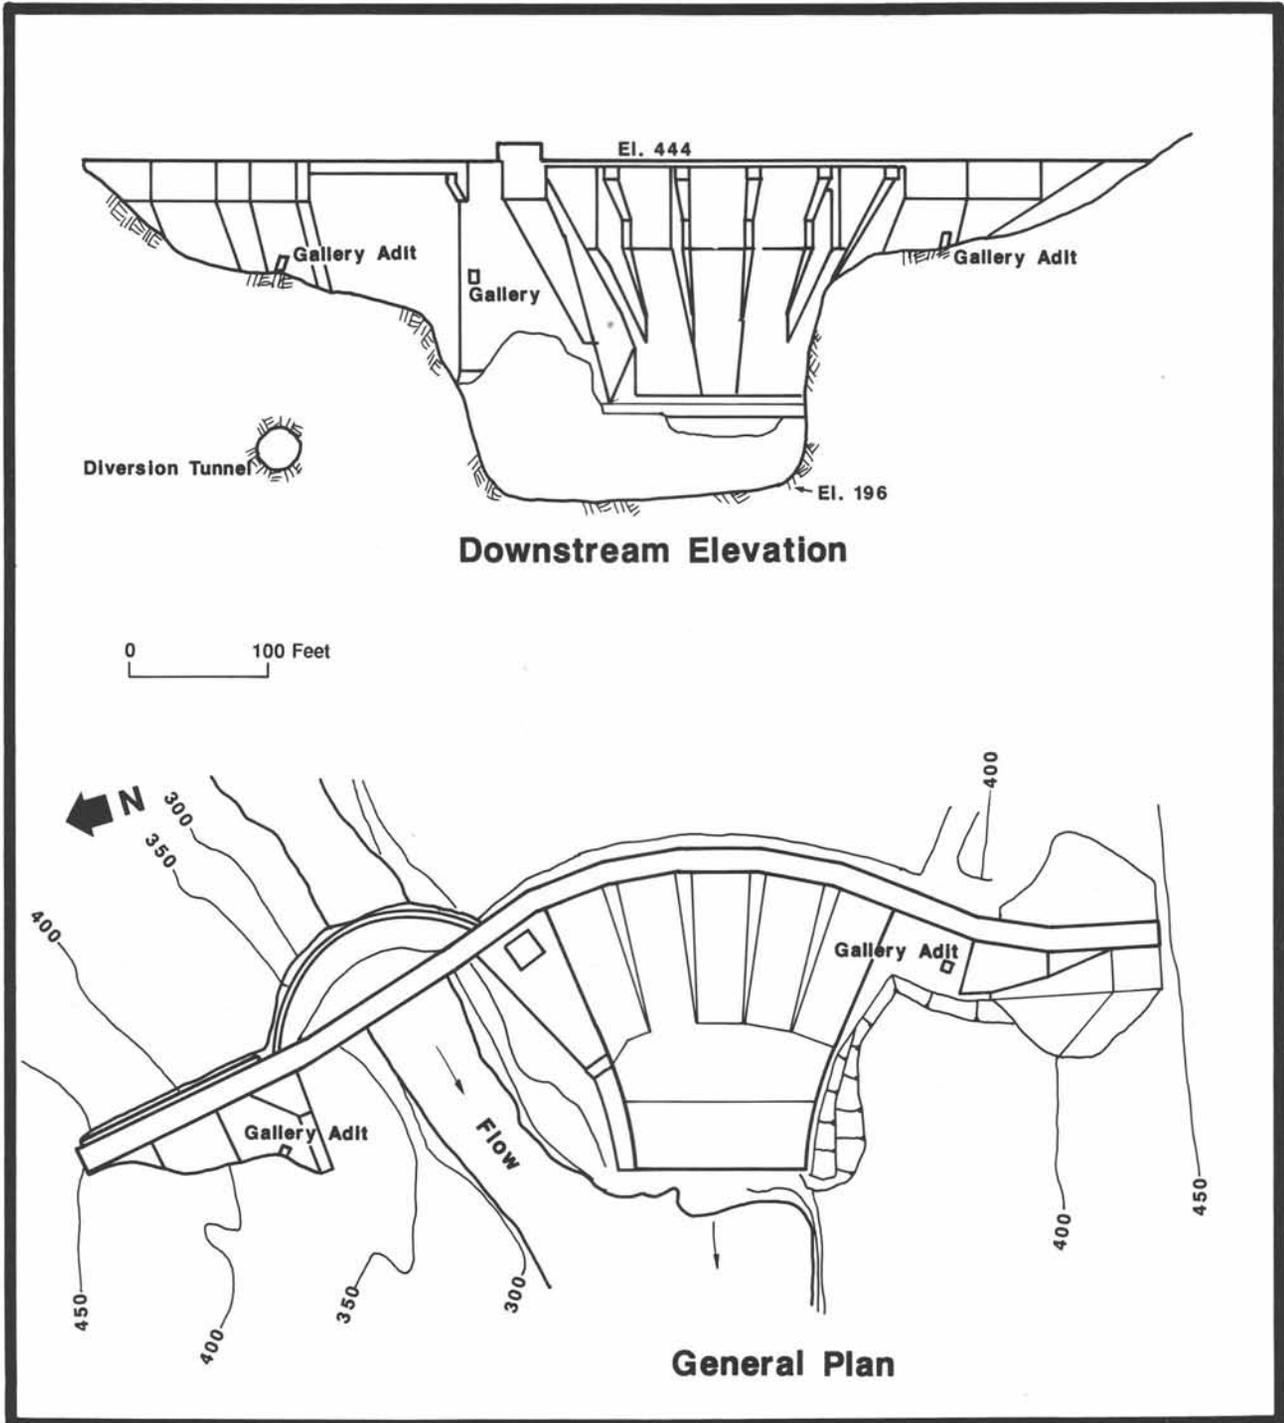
Mayfield Dam and spillway, plan and section; view upstream.
